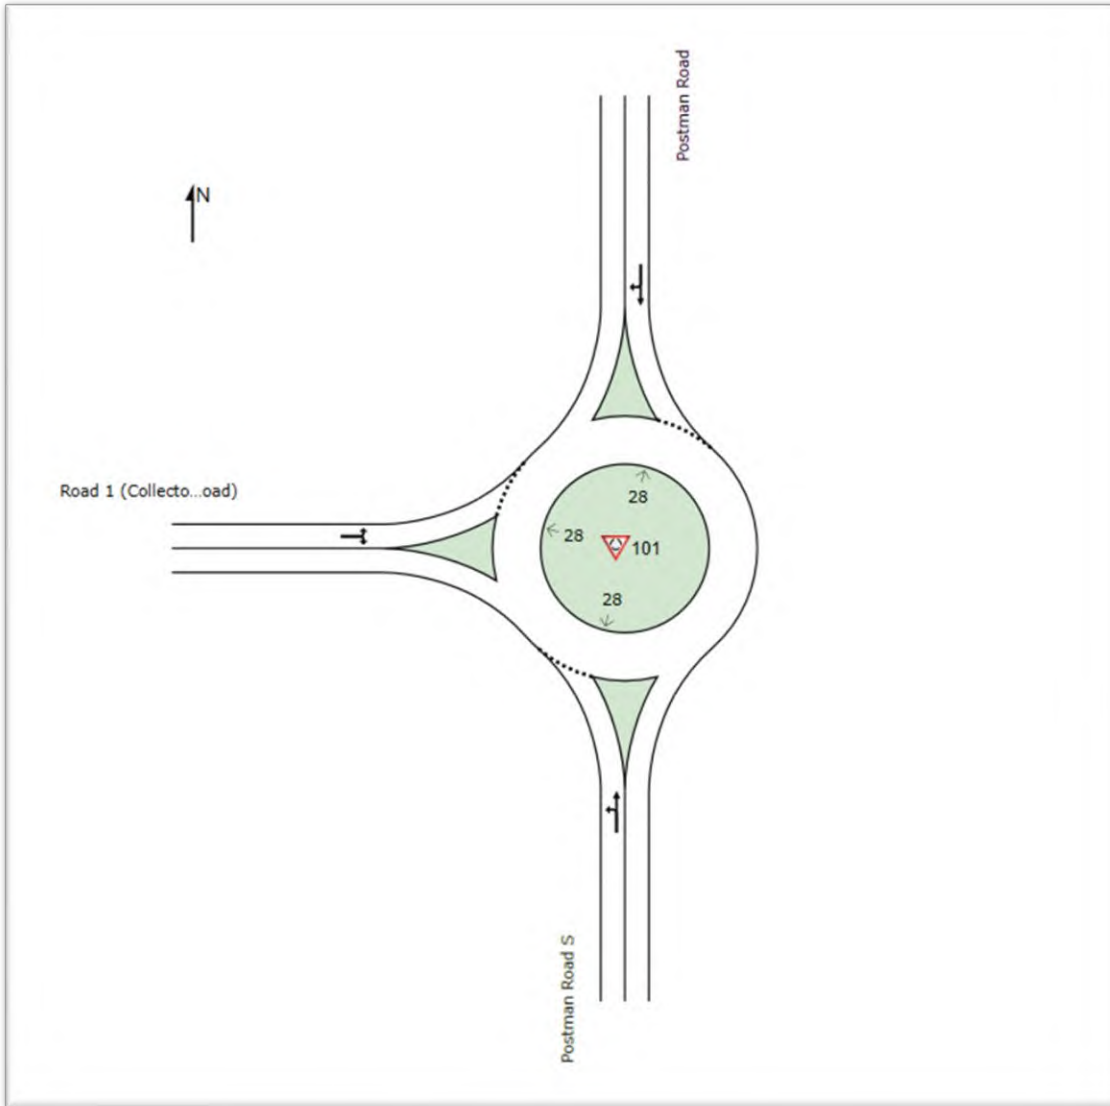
Postman Road and Collector Road Layout - Full built-out Scenario
